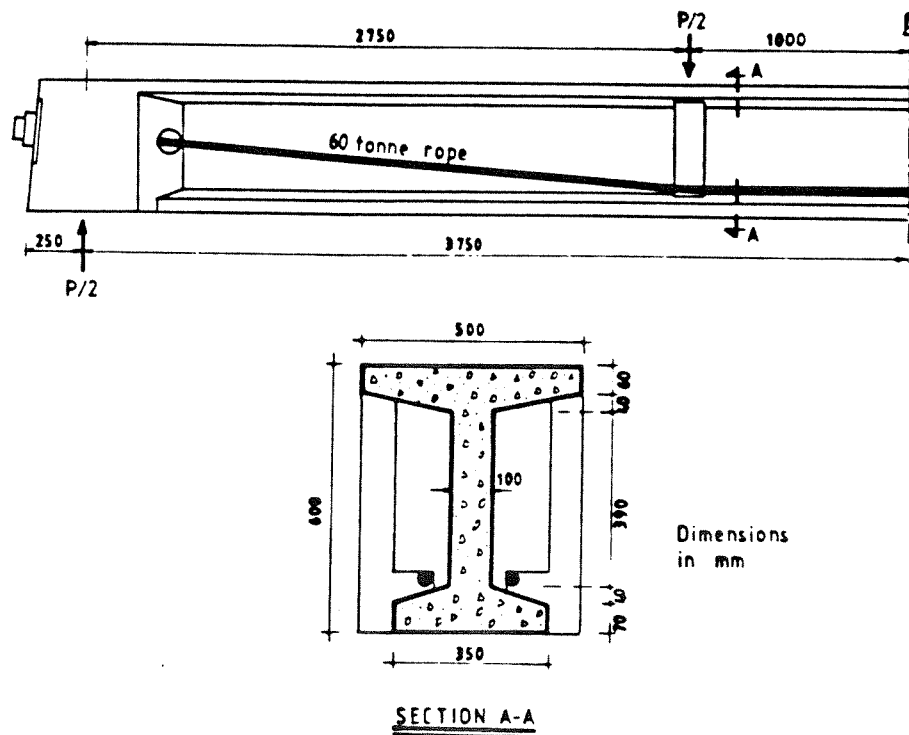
8m beam prestressed with 2 external Parafil tendons.
